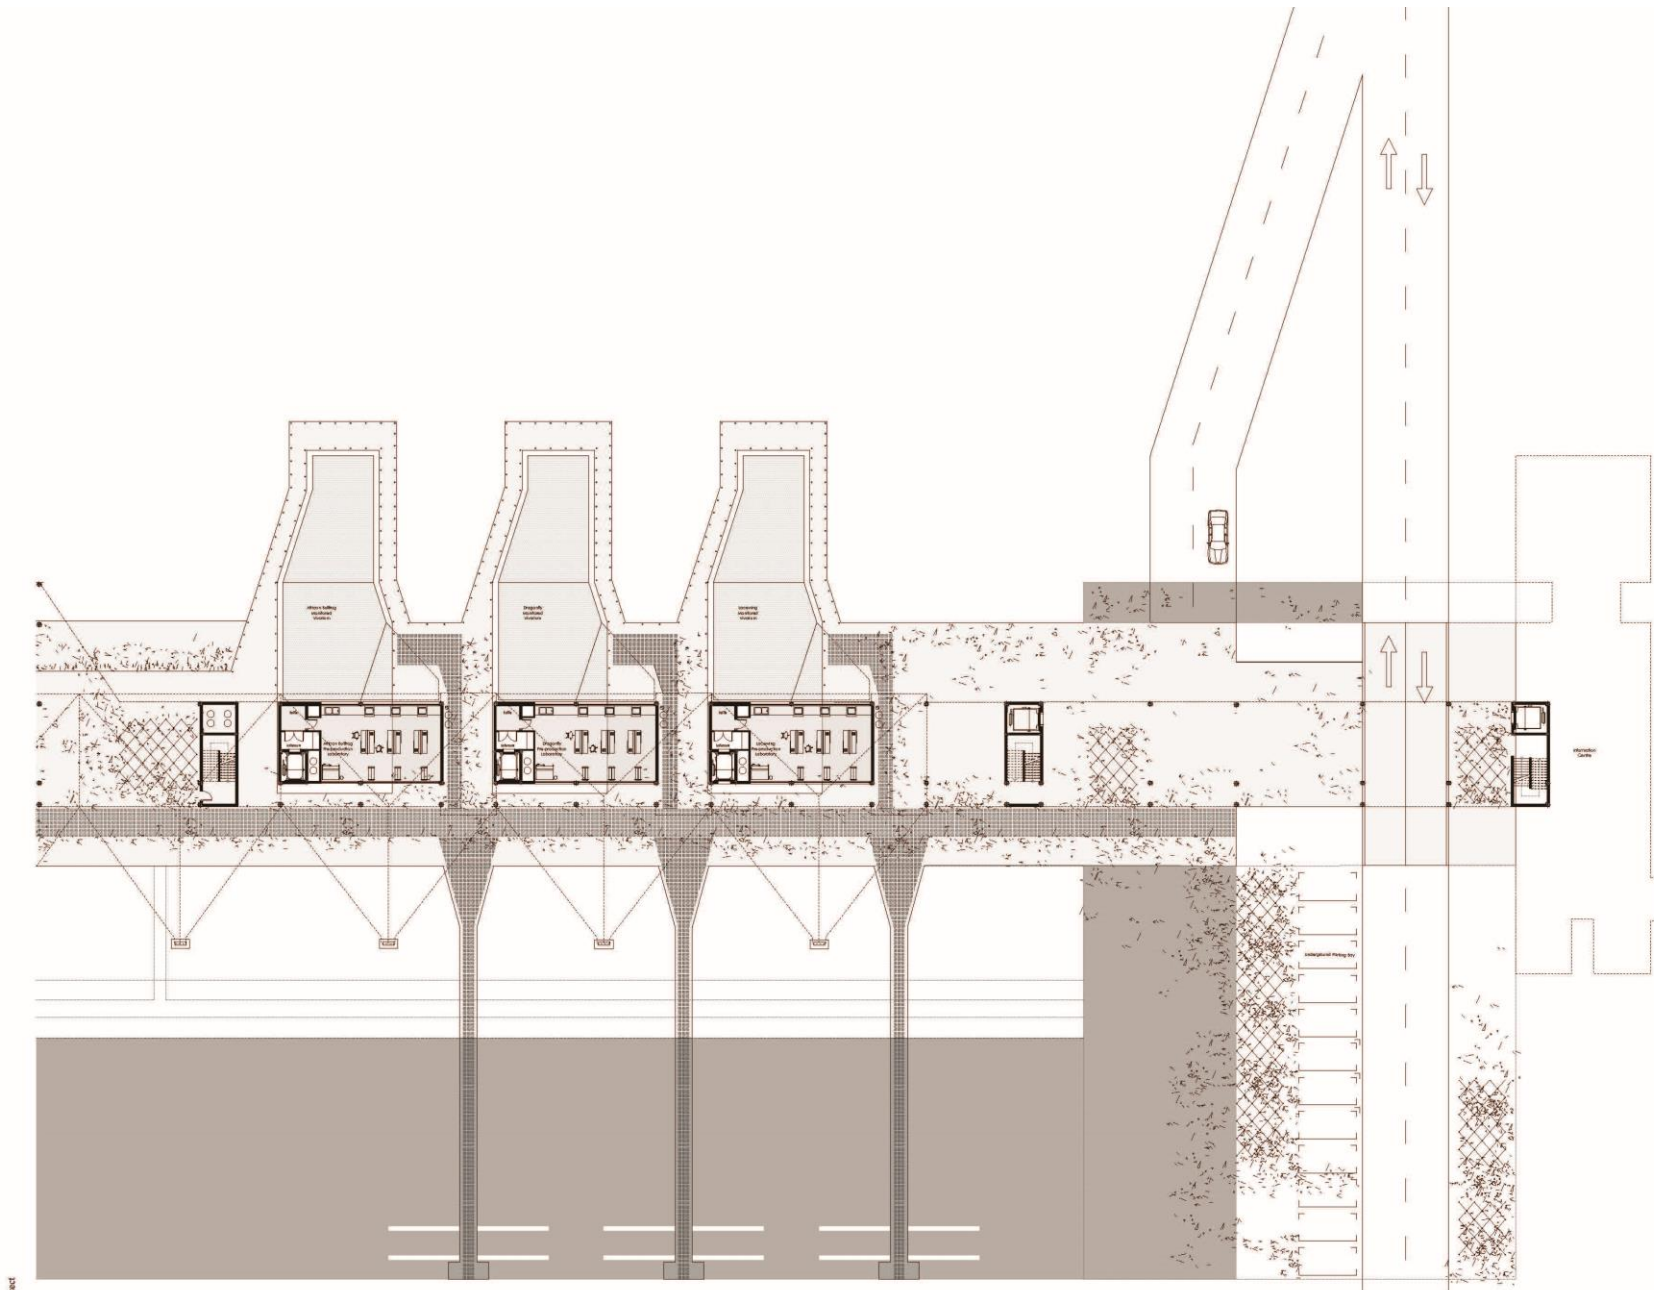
Ground floor plan, "Landscaped Portal" (Author, 2013)
